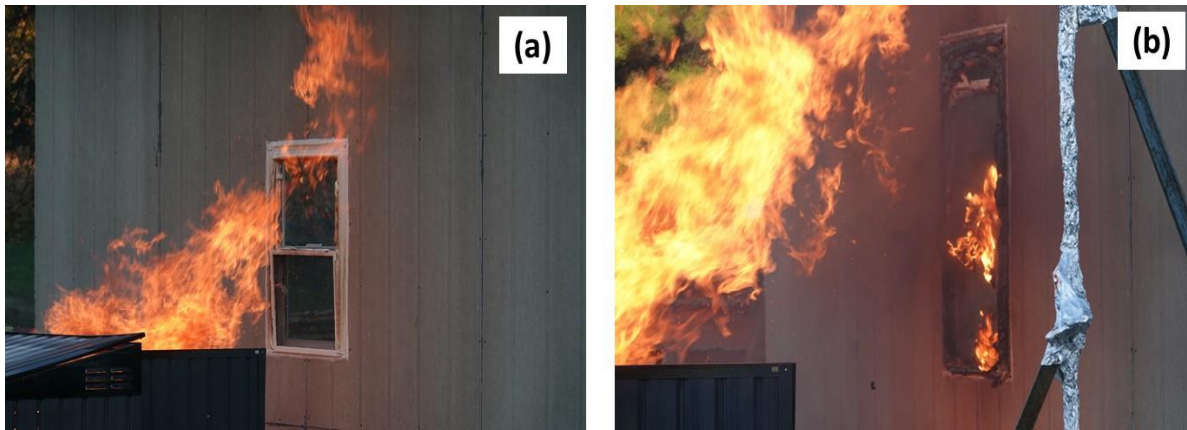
Photographs showing (a) flame jetting from noncombustible steel Closet in test [O-Schw-5](#) and (b) ignition of vinyl frame.
